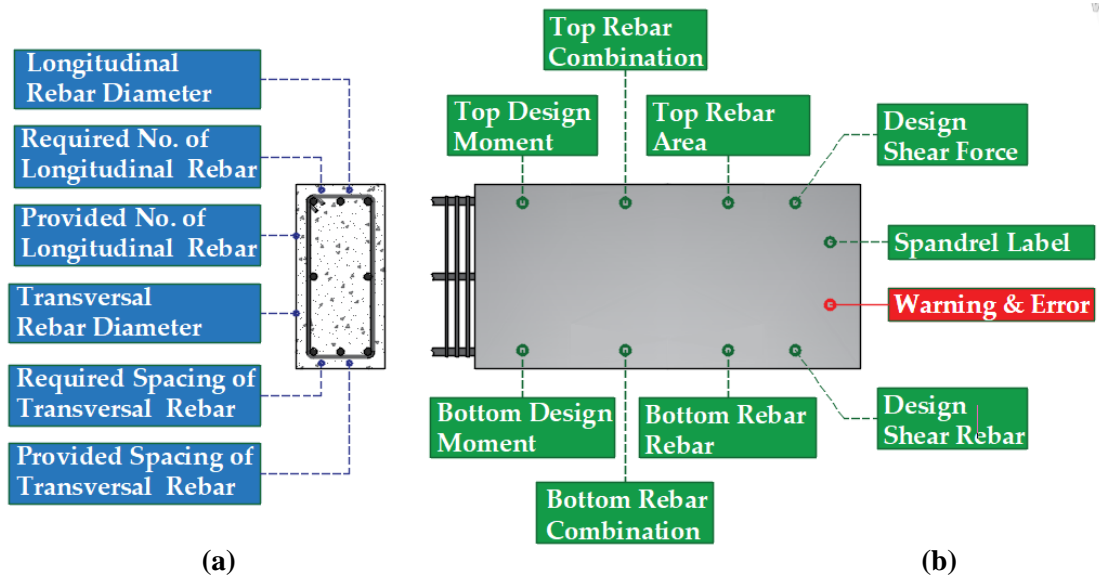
Some spandrel wall parameters (a) Section view (b) Elevation view
